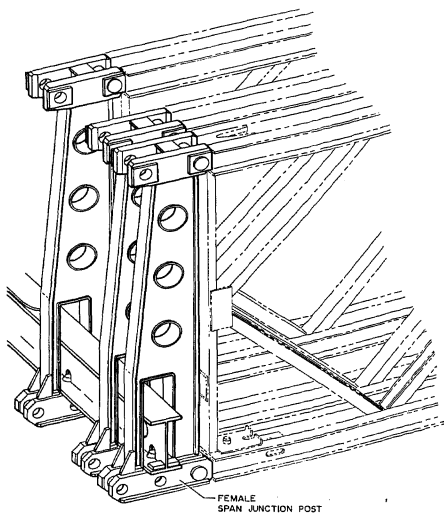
Span junction posts installed on end of M2 panel bridge.
